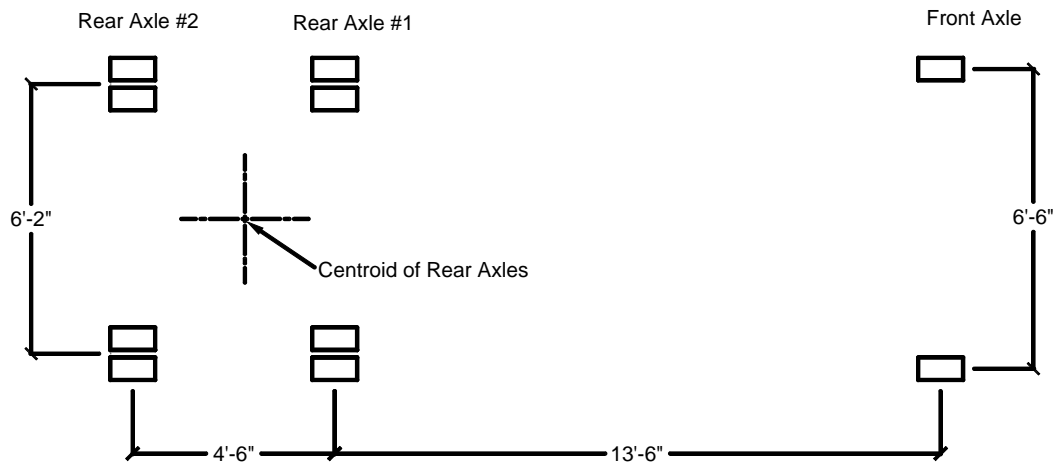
Ten Cubic-Yard Dump Truck Used for Load Testing
